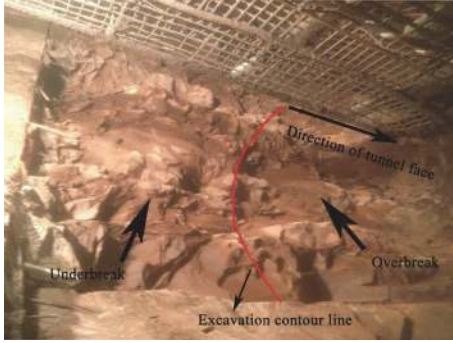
A typical working face with overbreak and underbreak after two-step blasting.
